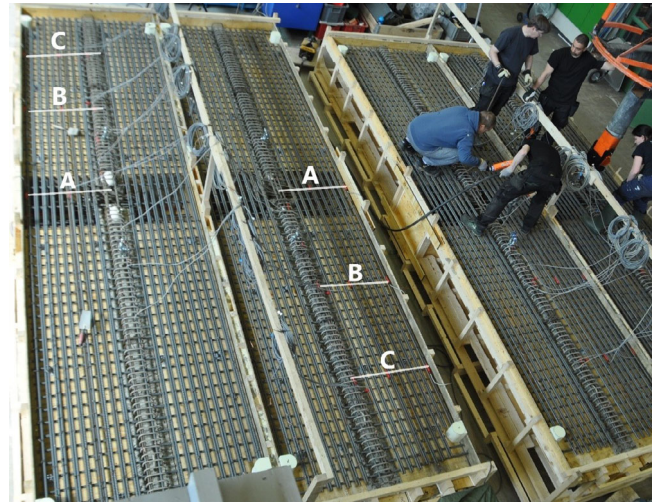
Flange reinforcement of test beams and instrumented cross sections A, B, and C
